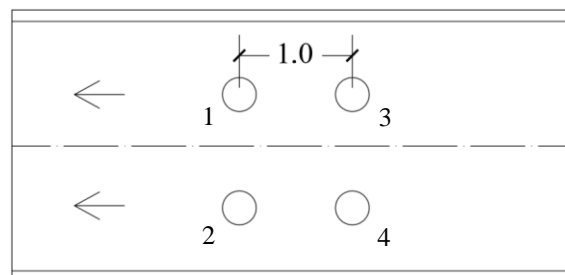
Sketch of the pedestrians' layout on the footbridge. Unit in meters.
